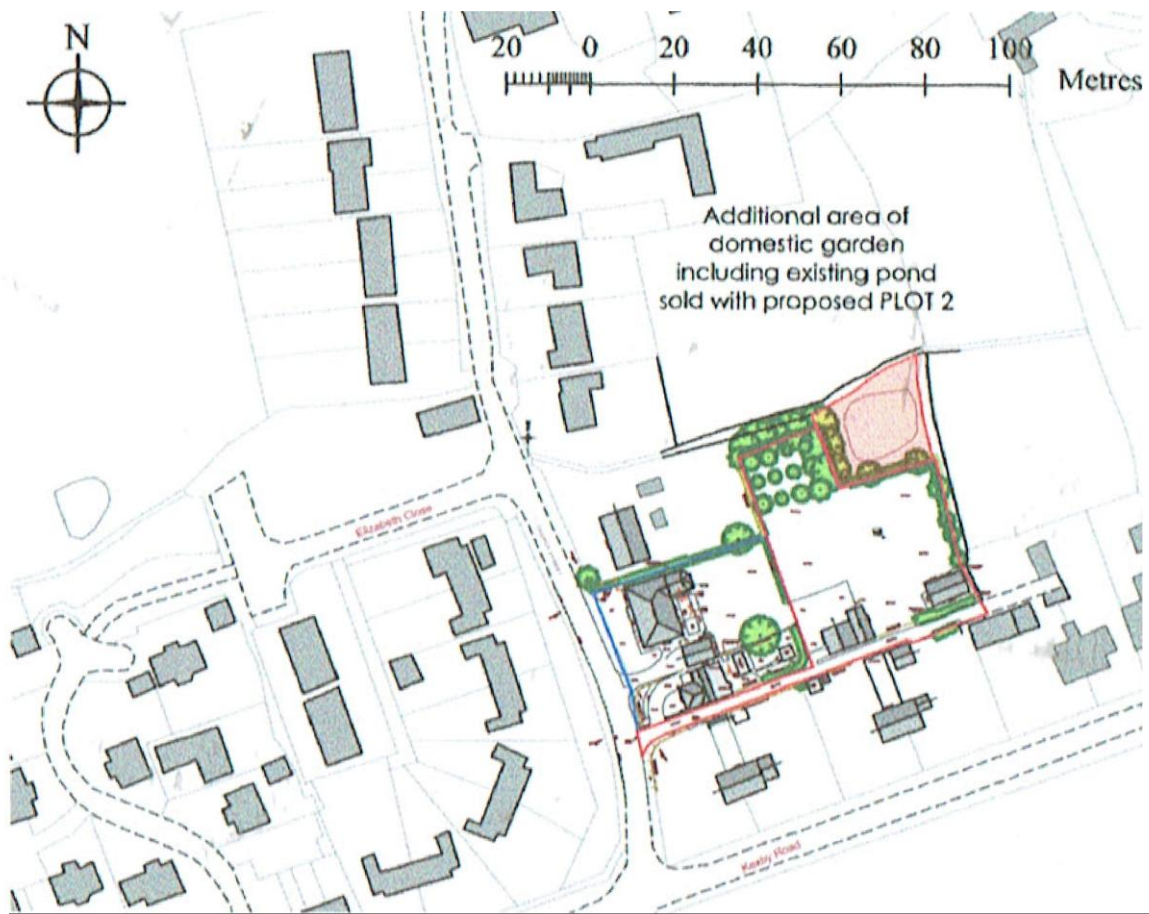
Site location at an original scale of 1:1,250 showing the existing site layout, (not to scale), (extract from Architects plan)
